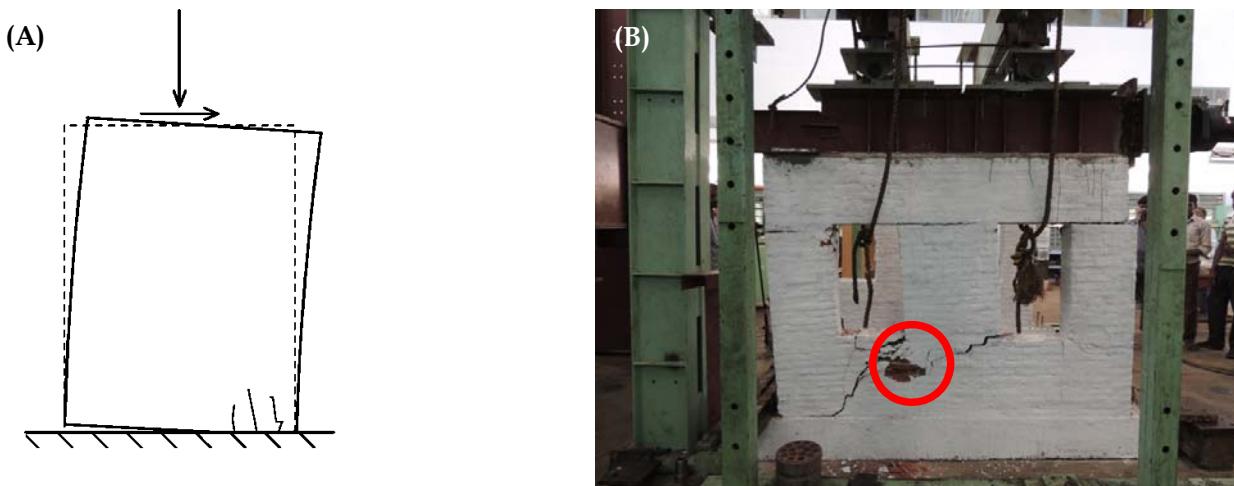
(A) Sketch showing the crushing of the compressed toe at the base of the masonry wall due to in-plane rocking mechanism in the wall pier; (B) Crushing observed in the wall pier in a wall subjected to in-plane deformation
